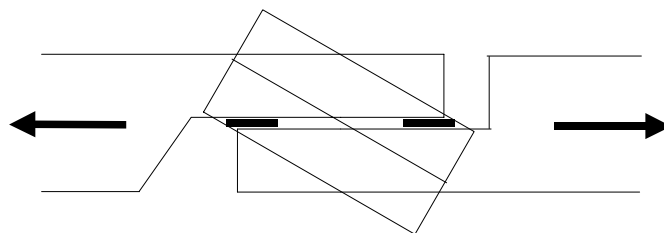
Cutting slits in the nail plate to avoid anchorage failure.
